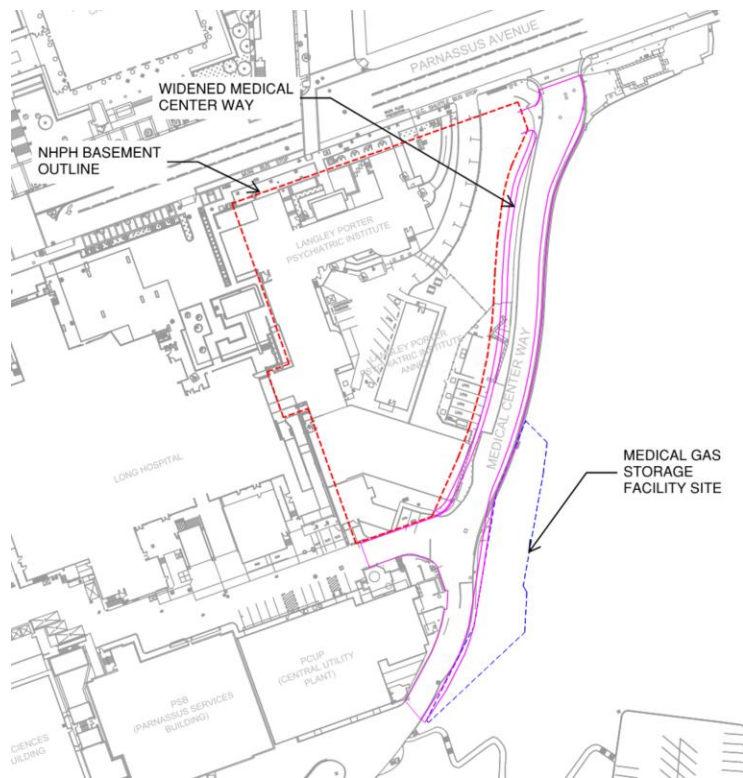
Future Layout of New Hospital, MCW and the Medical Gas Storage Facility Site Approximate Boundaries
